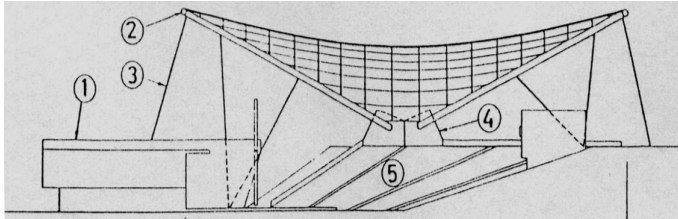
Vertical cross-section of open-air theatre, marking: 1 – stage building, 2 – steel arc, 3 – guy, 4 – reinforced concrete abutment, 5 – audience
